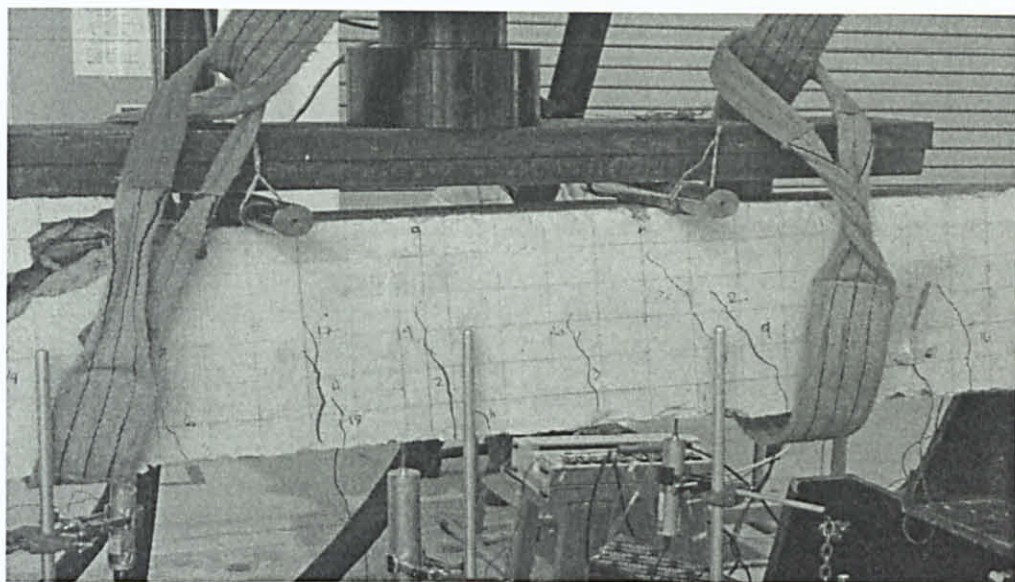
Crack pattern of control beam subjected to static load.
